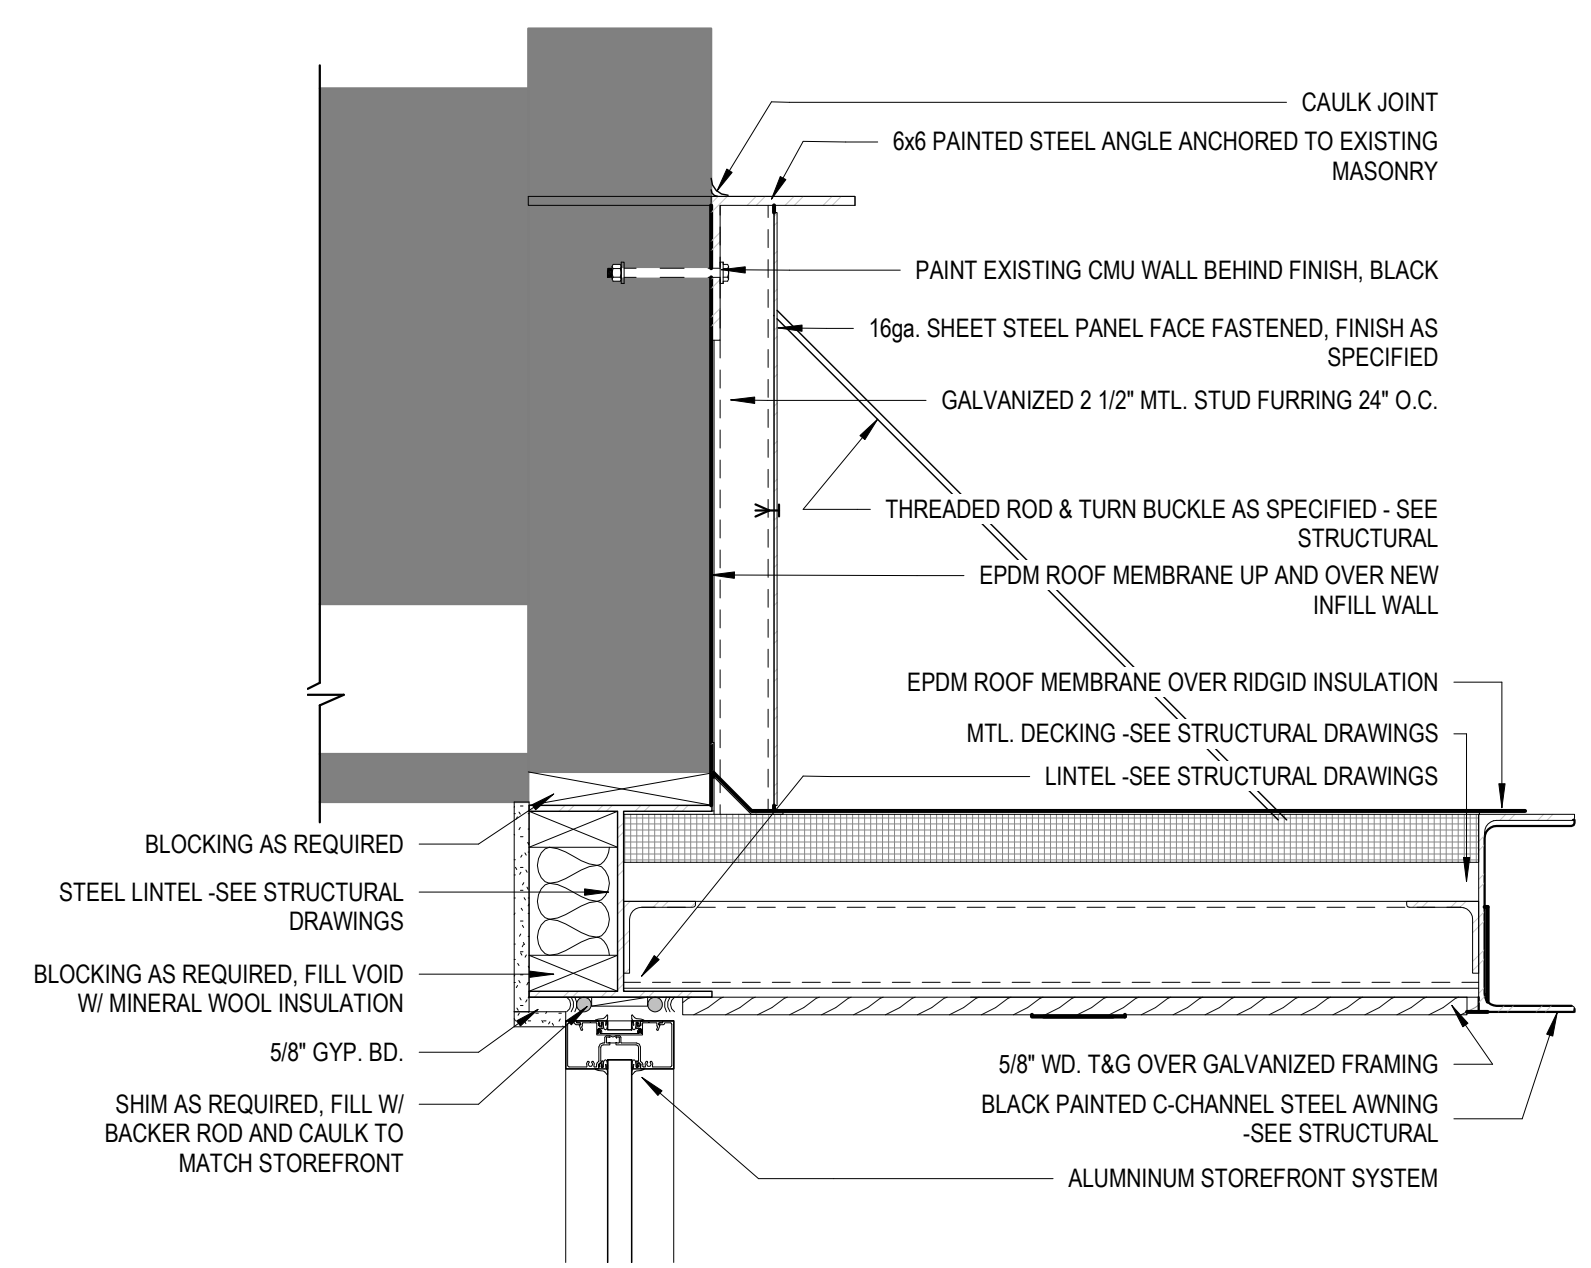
DETAIL @ NEW SENIOR CENTER ENTRY CANOPY 5
